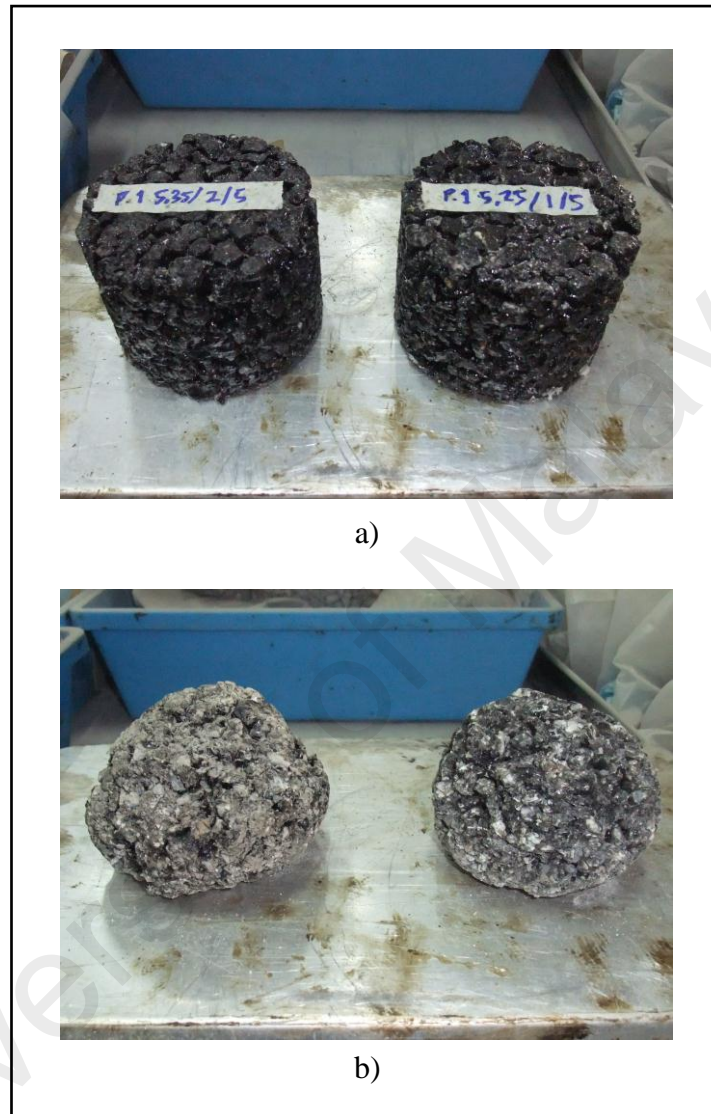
a) Specimens before Cantabro and b) Specimens after Cantabro
